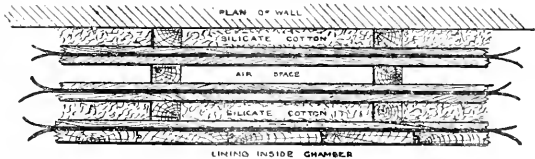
METHOD OF BUILDING INSULATED WALL FOR COLD STORE, AS ARRANGED BY MESSRS. H. J. WEST AND CO.
